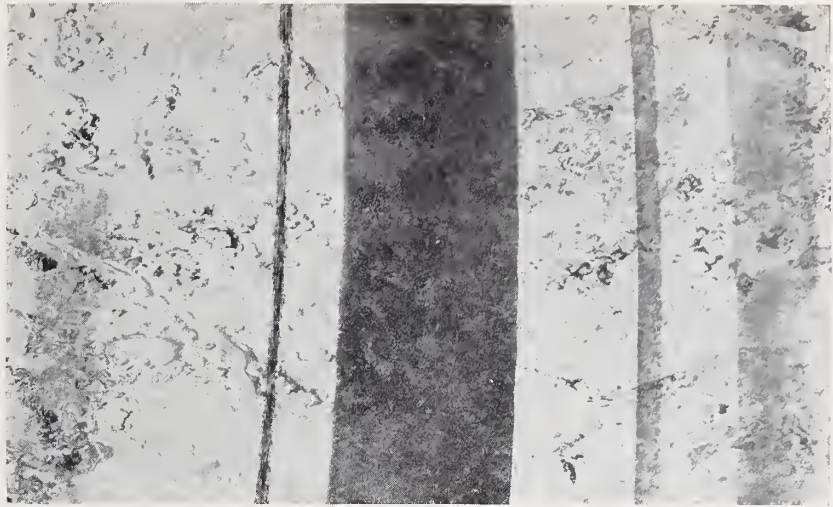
$\frac{1}{8}$ -in. marbled linoleum on strip-wood subfloor (test panel 2R).
